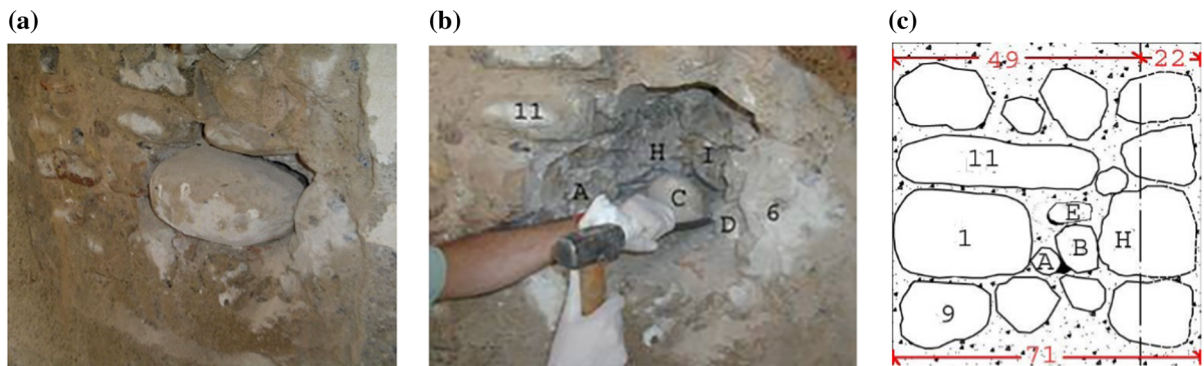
Analysis of wall cross-section: a masonry texture and starting of first stone extraction; b hole after masonry disassembling; c drawing of left vertical face of cross-section (without reaching other side) [12]
